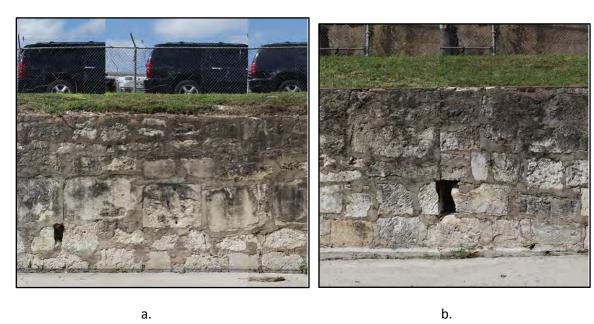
Two limestone block sizes and treatments along west retaining wall.
